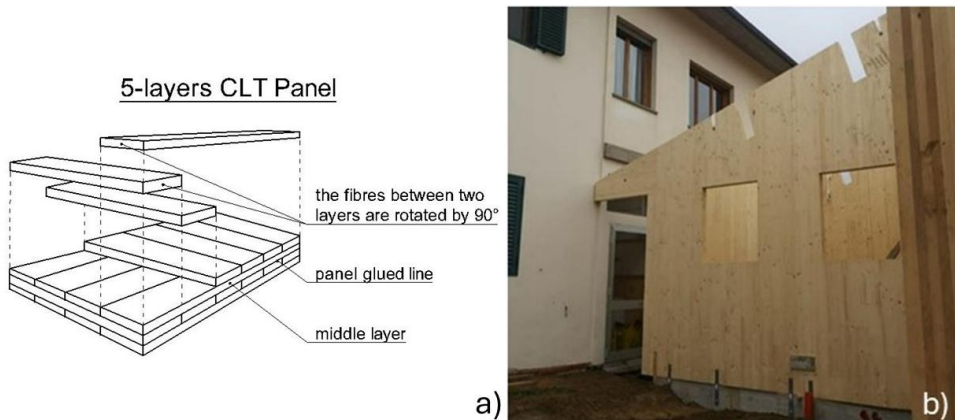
CLT panel: a) scheme of 5-layer CLT panels, b) installation example
